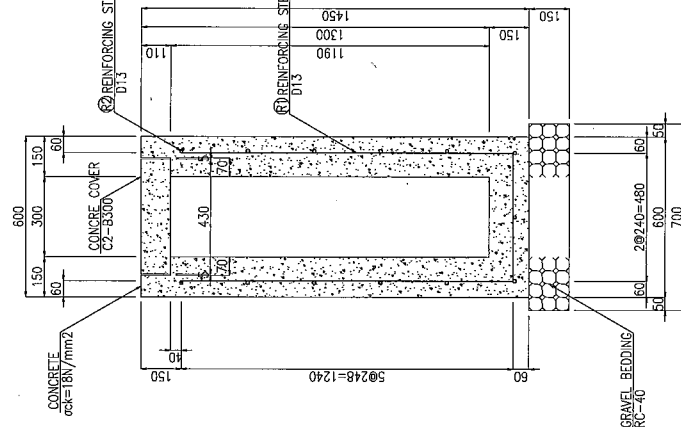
# DETAIL OF DRAINAGE STRUCTURE (1/2)
